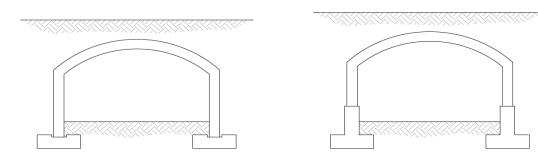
Typical Reinforced Concrete Spread Footing Foundations (Left: Spread Footing, Right: Pedestal Footing)
